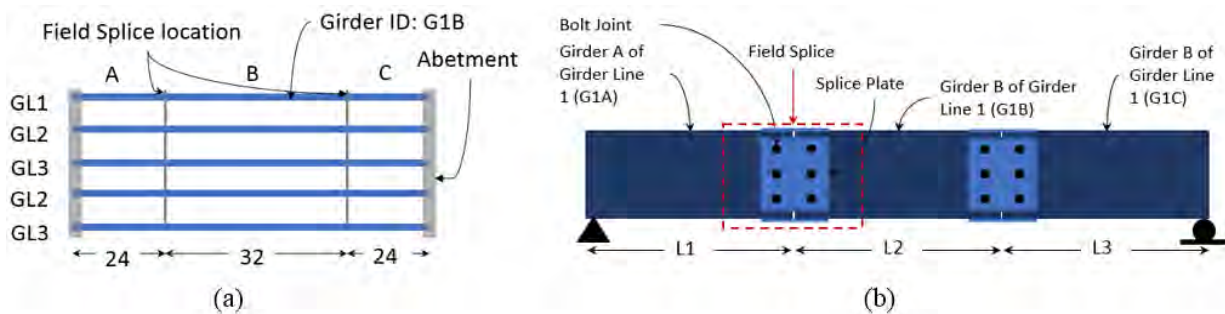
Schematic diagram of (a) typical girder line and (b) individual girder separated by the splice joint of steel girder bridges.
